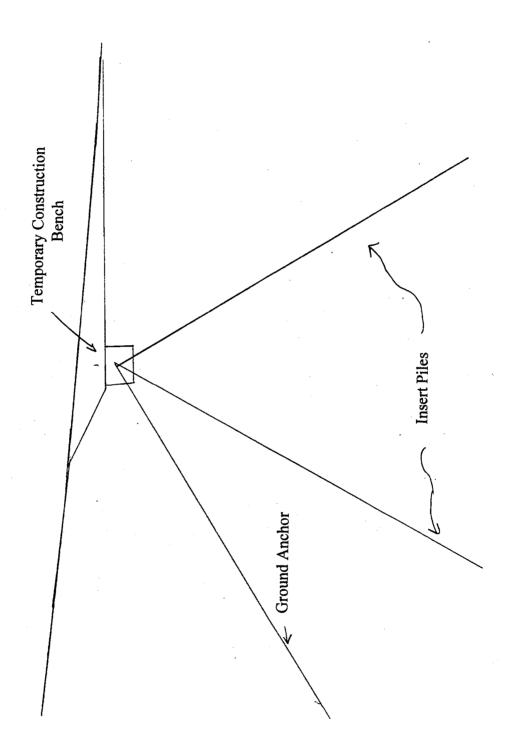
Typical cross-section of an INSERT wall. (Wolosick, 1994)
